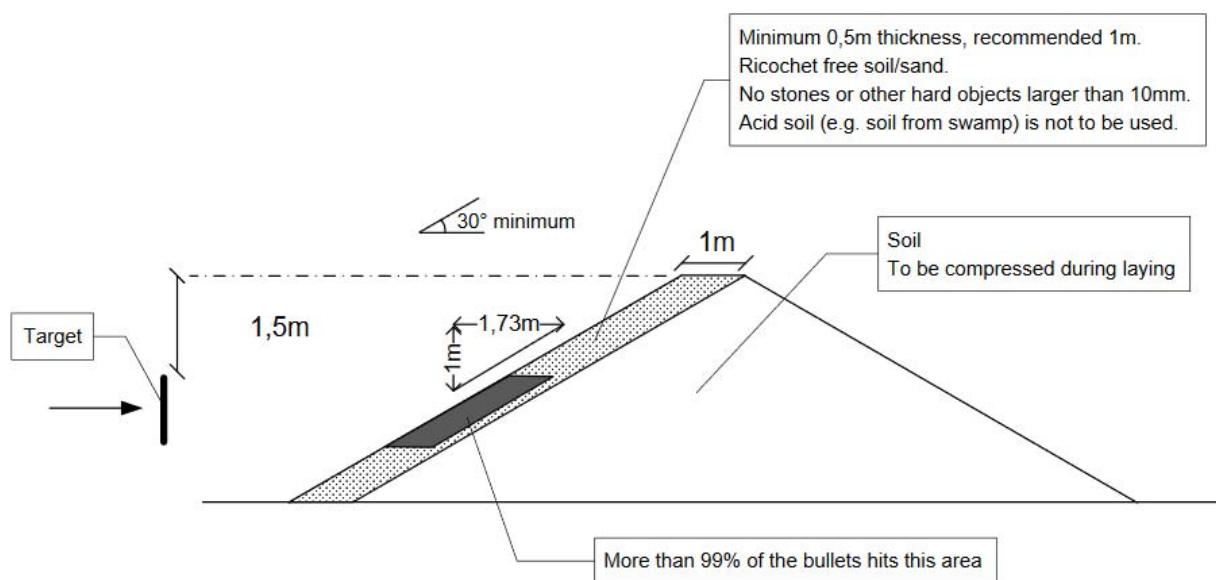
Cross section of bullet containment with minimum dimensions (comment #3245)
